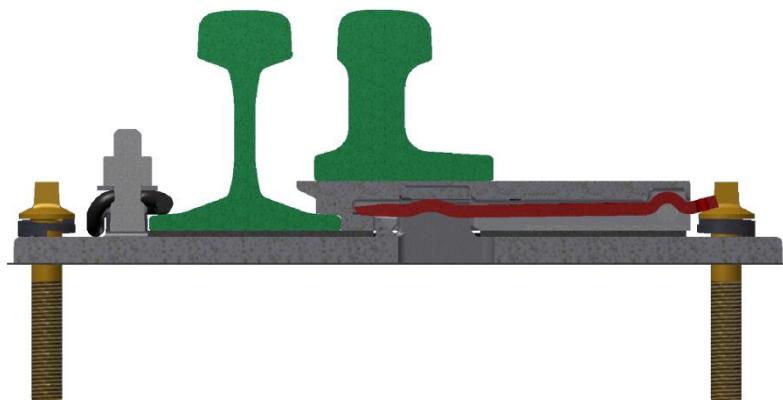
An example of a slide base plate fastening system made more flexible. A flexible pad is also under the slide plate, which makes the tongue rail more flexible as well
